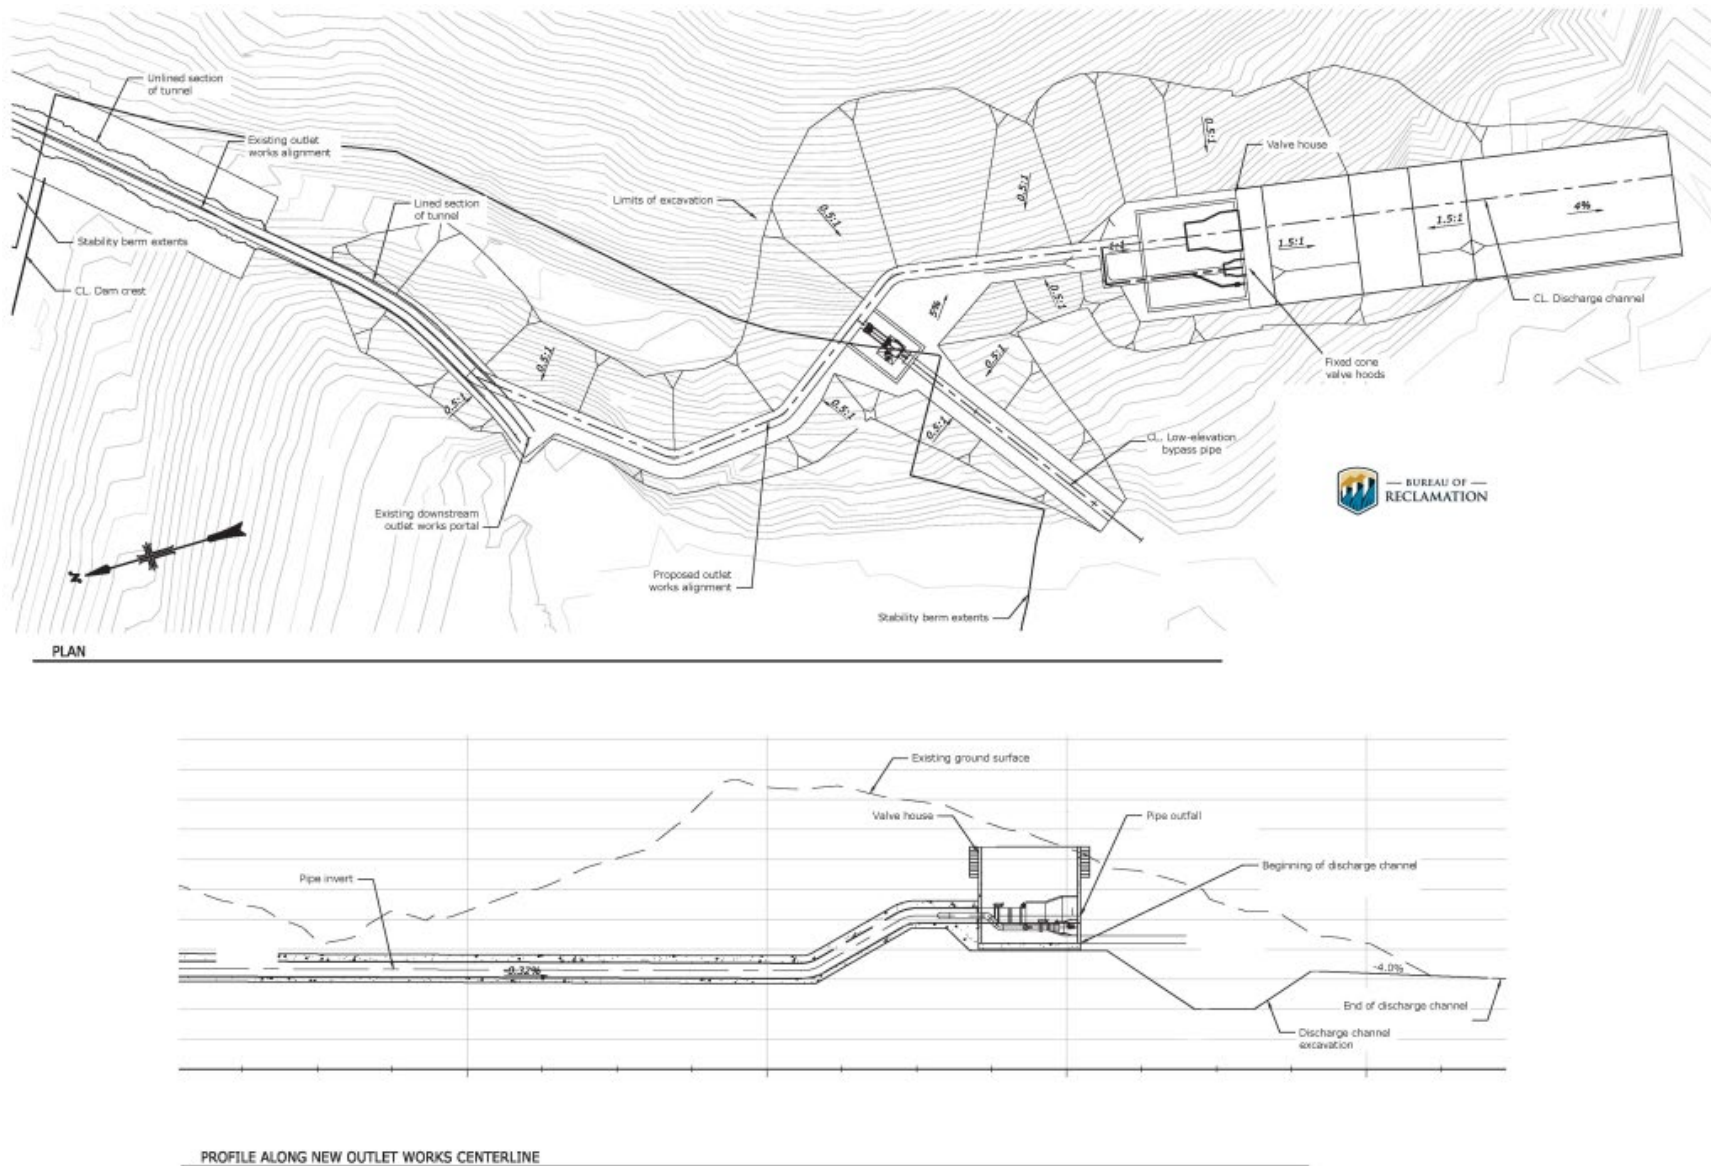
Overview and profile of Alternative B outlet works – east alignment
